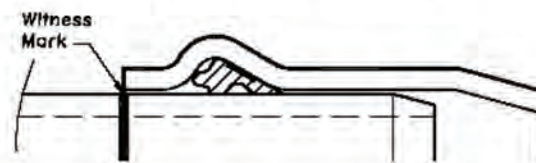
Rieber rubber ring joint (Series 1 and 2 pipe – ring supplied pre installed in pipe socket and cannot be removed)
